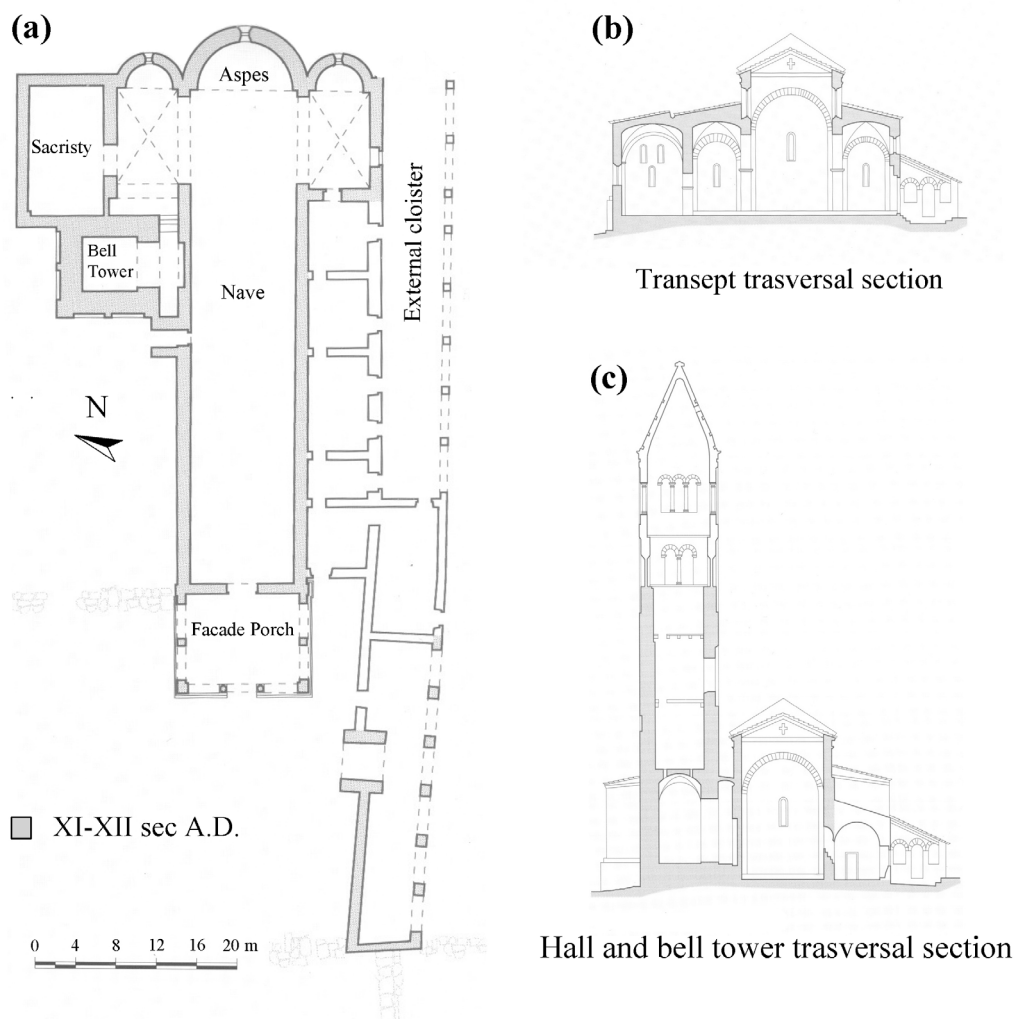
The Saccargia Basilica: (a) plan; (b) transept transversal section; (c) hall and bell tower transversal section.
